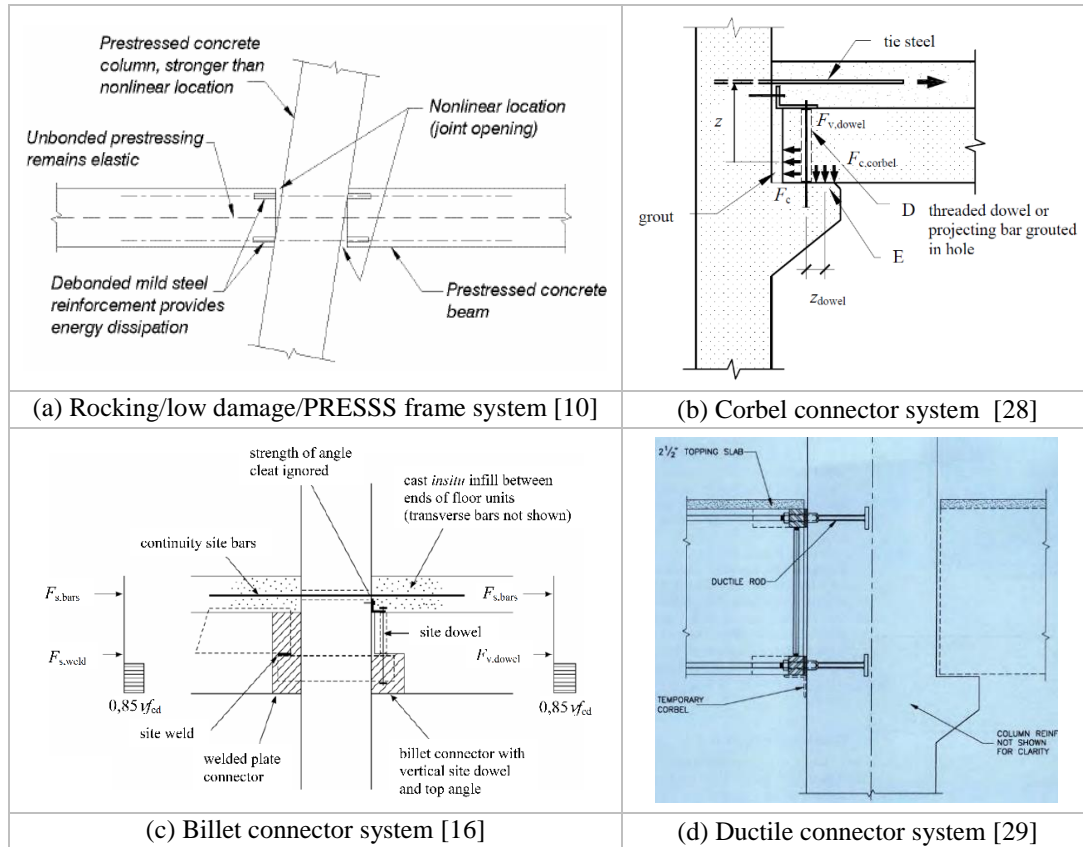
Jointed precast frame systems with use of un-bonded tendons or steel connections
